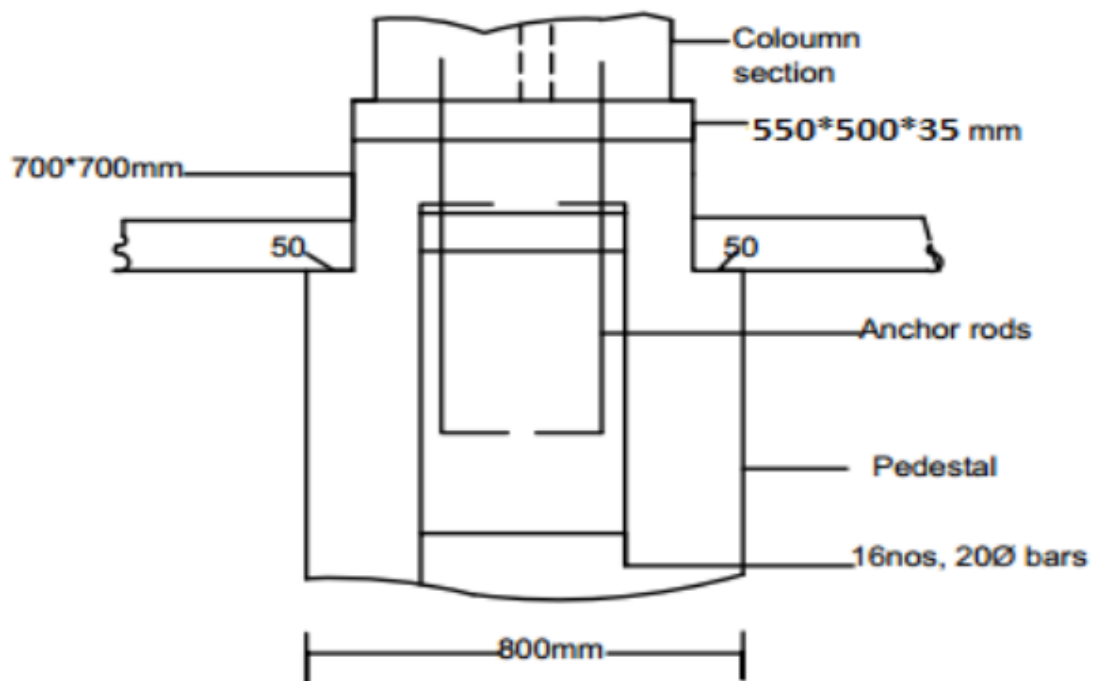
Reinforcement Details Of Foundation Of Middle Column
